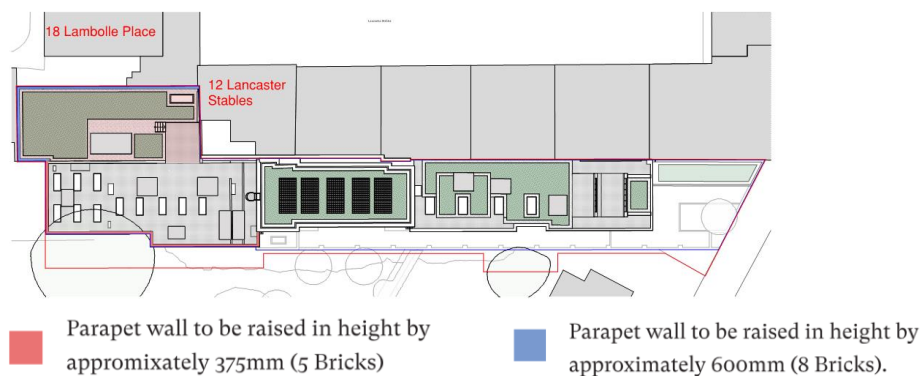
propose roof plan identifying parts of parapet wall to be raised
